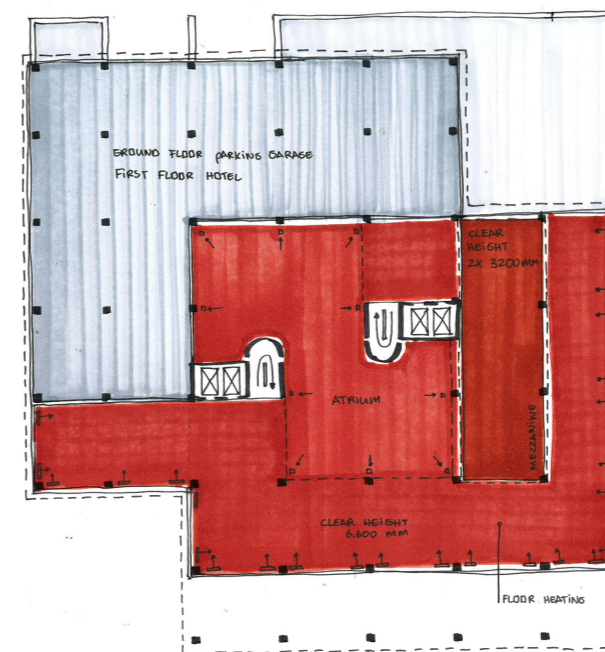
New double height ground floor with a mezzanine. Ventilation floor grills in inner edge of facade, natural draft trough atrium and underfloor heating (Lars Haga, 2026)
